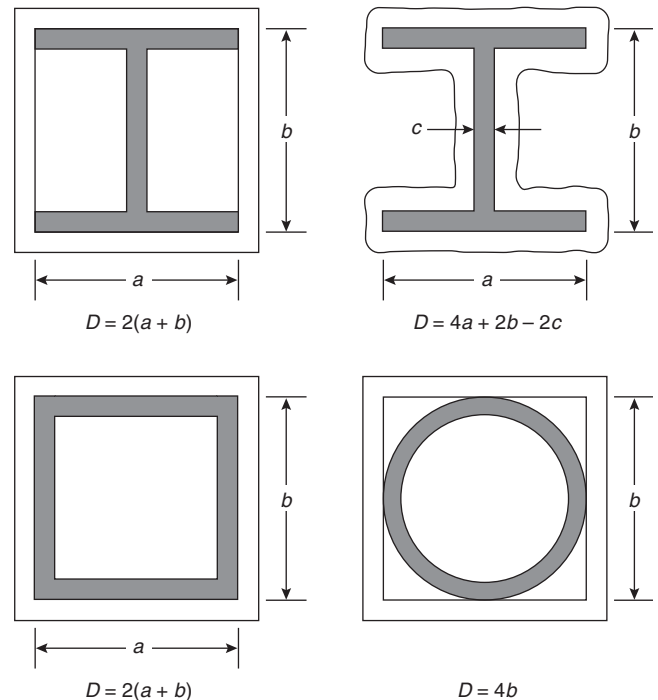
Heated perimeter for steel columns.²⁵
